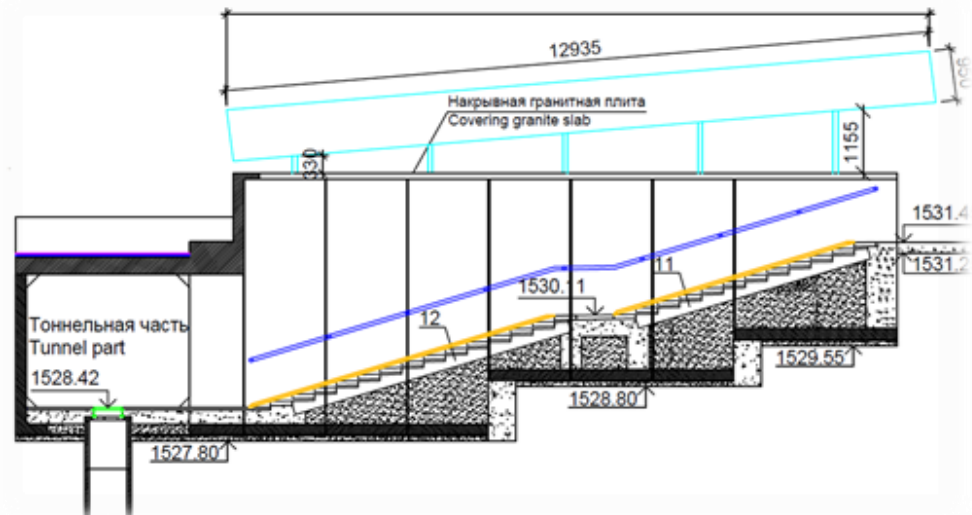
Typical cross-sectional drawing of pedestrian underpass.
